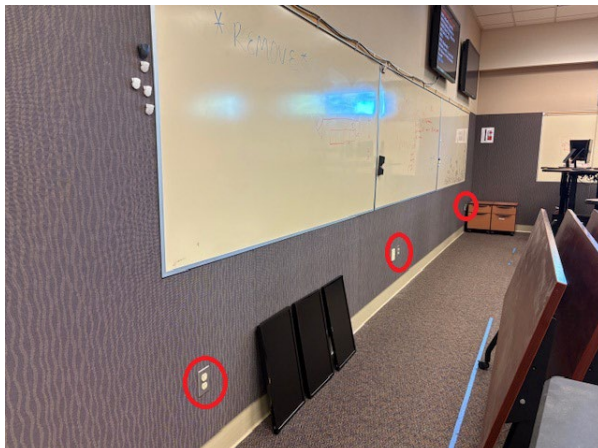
East Wall Detail. The lower outlets on this wall are marked by red circles and are at standard 16" height.
